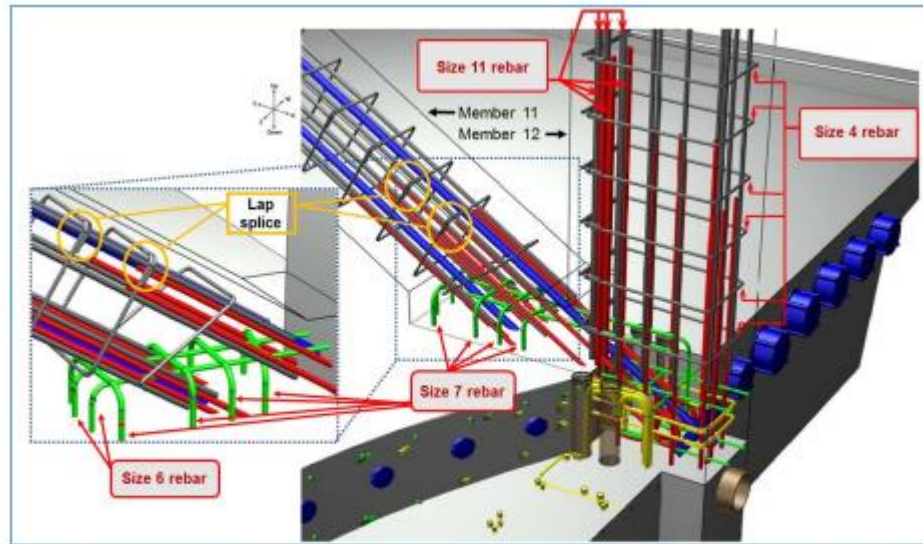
Main span, north end, showing rebar detailing in member 11, member 12, and node 11/12. Inset shows another view of rebar in node 11/12 and detail of lap splice from member 11. (Source: FHWA 2019)
